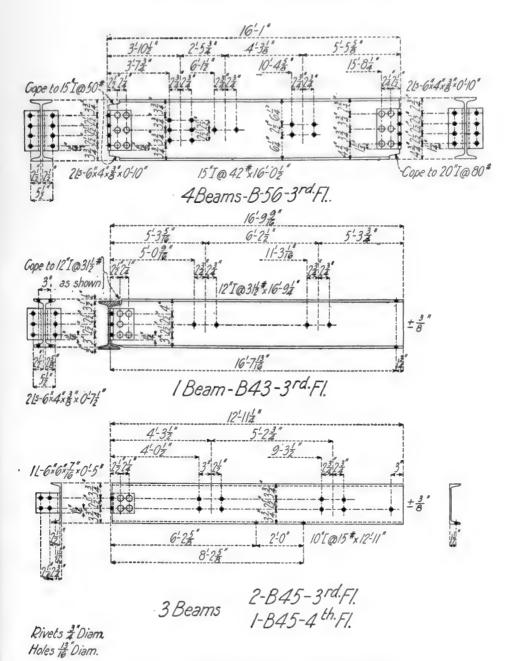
STANDARD DETAILS FOR ROLLED BEAMS.
